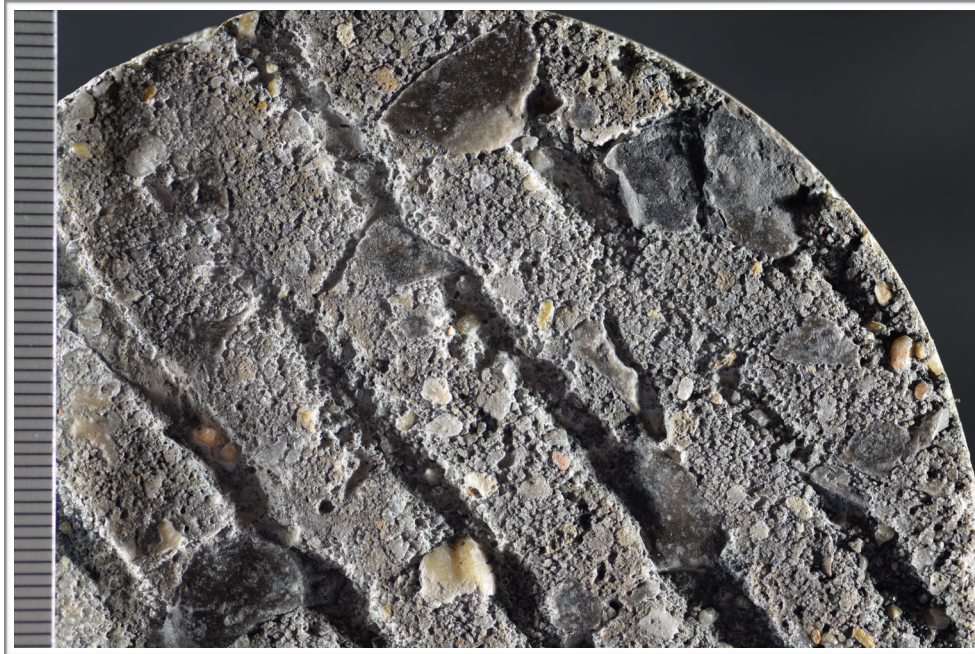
Photograph showing detail of the top surface of the core; scale in millimeters.
